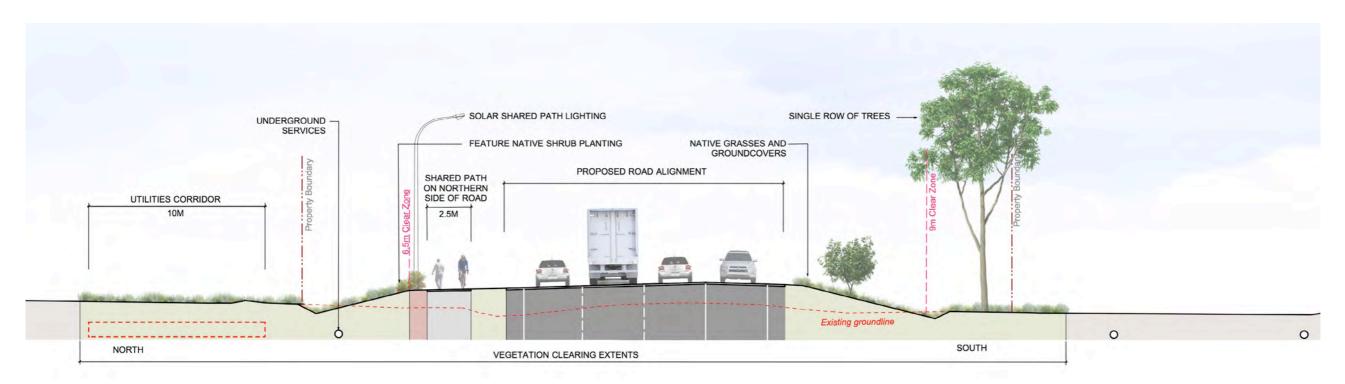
Typical cross section of Boulevard treatment in Zone 2, shown at station 6,300
